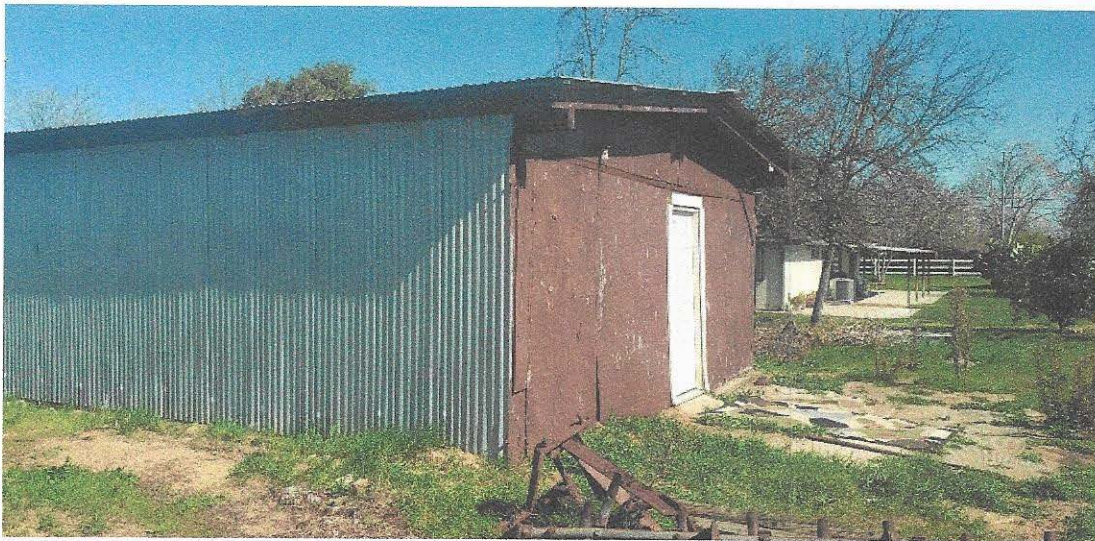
B: Out-Building at 463 Honey Lane (viewing southwest)
